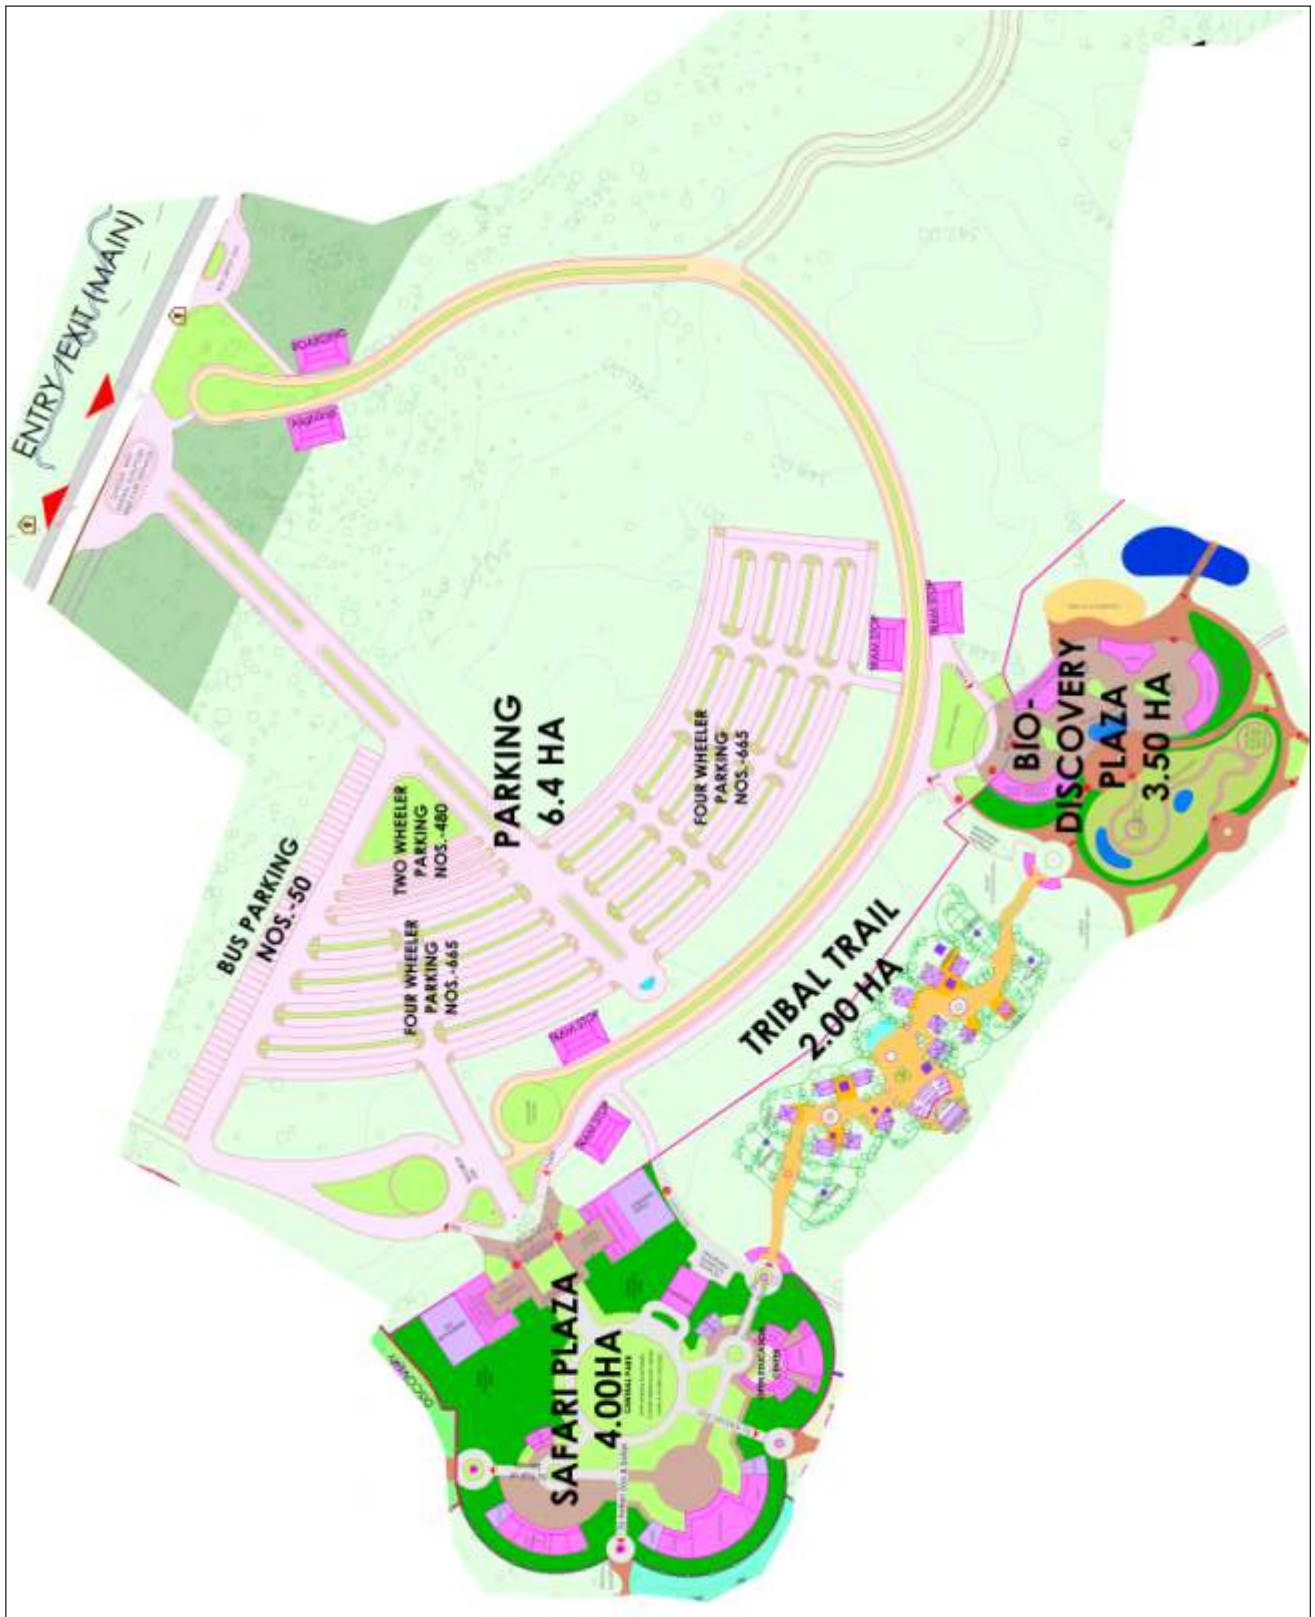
Entry Plaza Layout - Revised (Feb'23)
